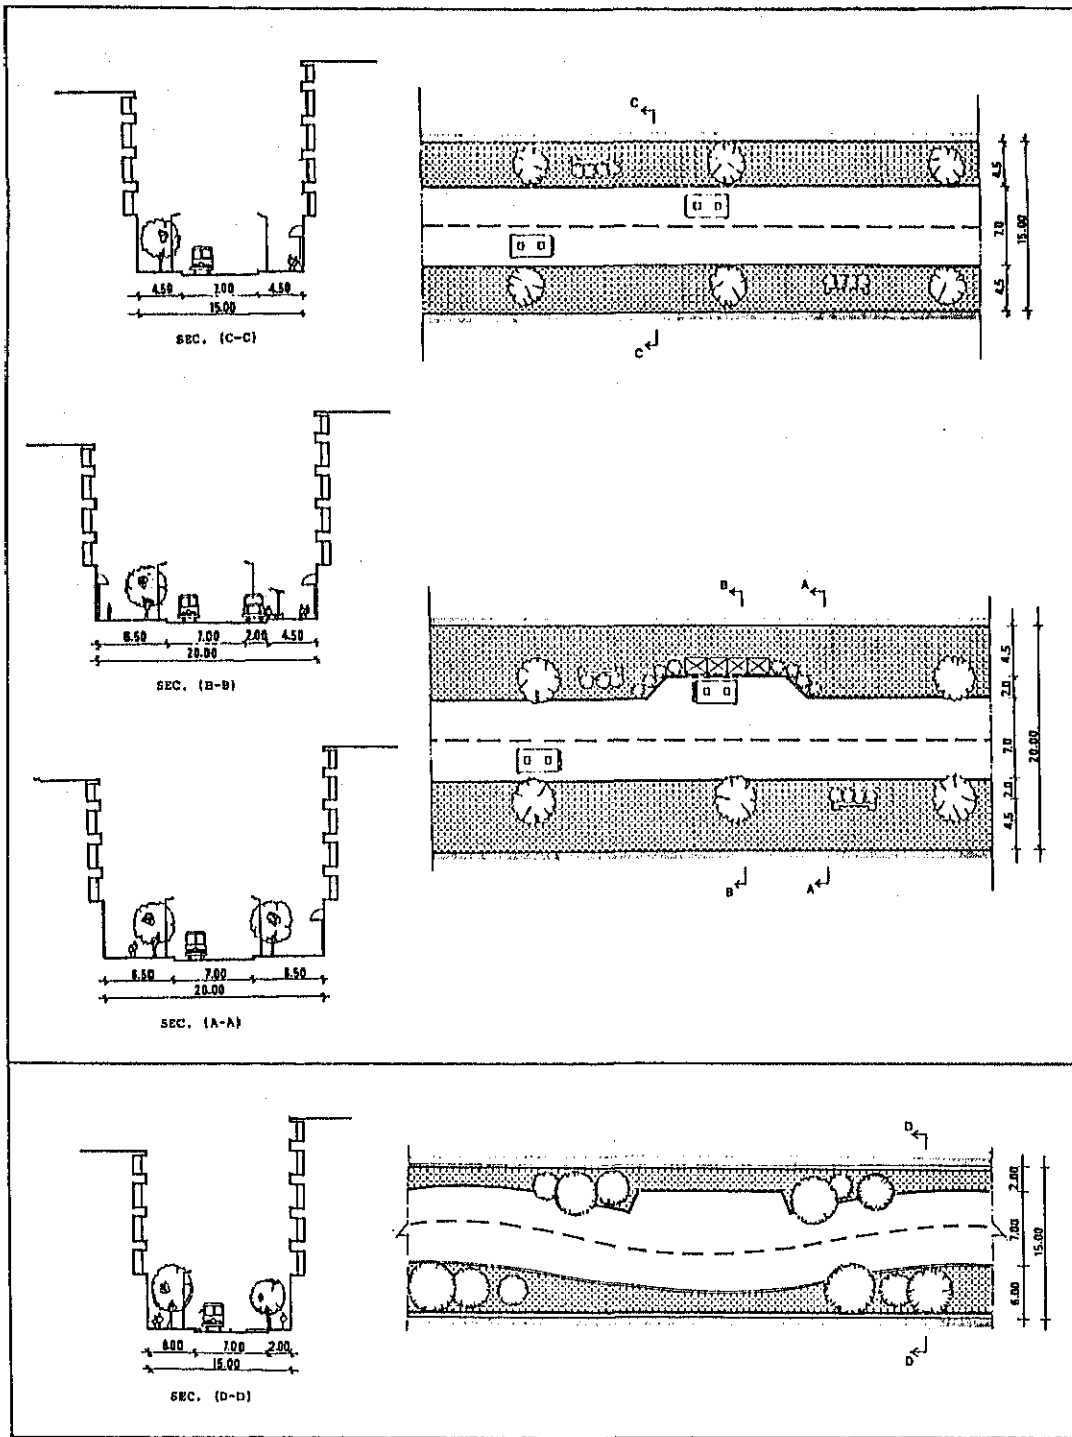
Typical Cross Section of Exclusive Bus Arterial
